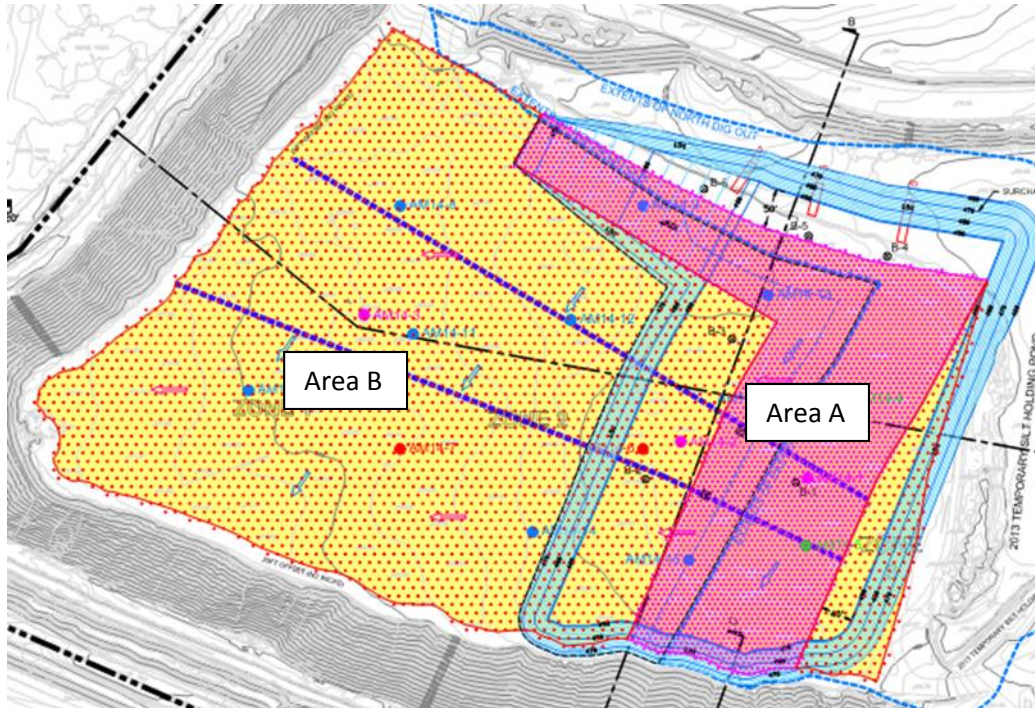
Plan view showing wick drain installation locations. Area A has wick drains on a 2.2 meter spacing, and is the area of the dam removal. Area B has wick drains on a 3.8 meter spacing.
